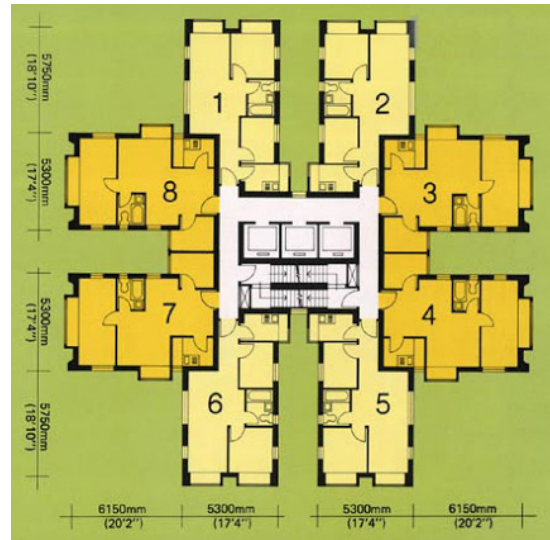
Typical floor plan of amoy gardens³³, a middle-class private housing development built from 1981 to 1987.
